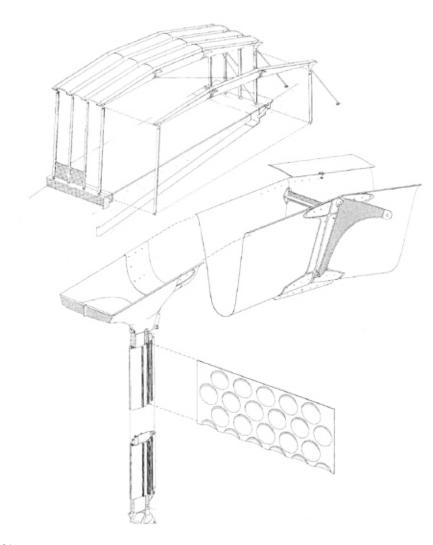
Detailed axonometric drawing of the aluminium frame
